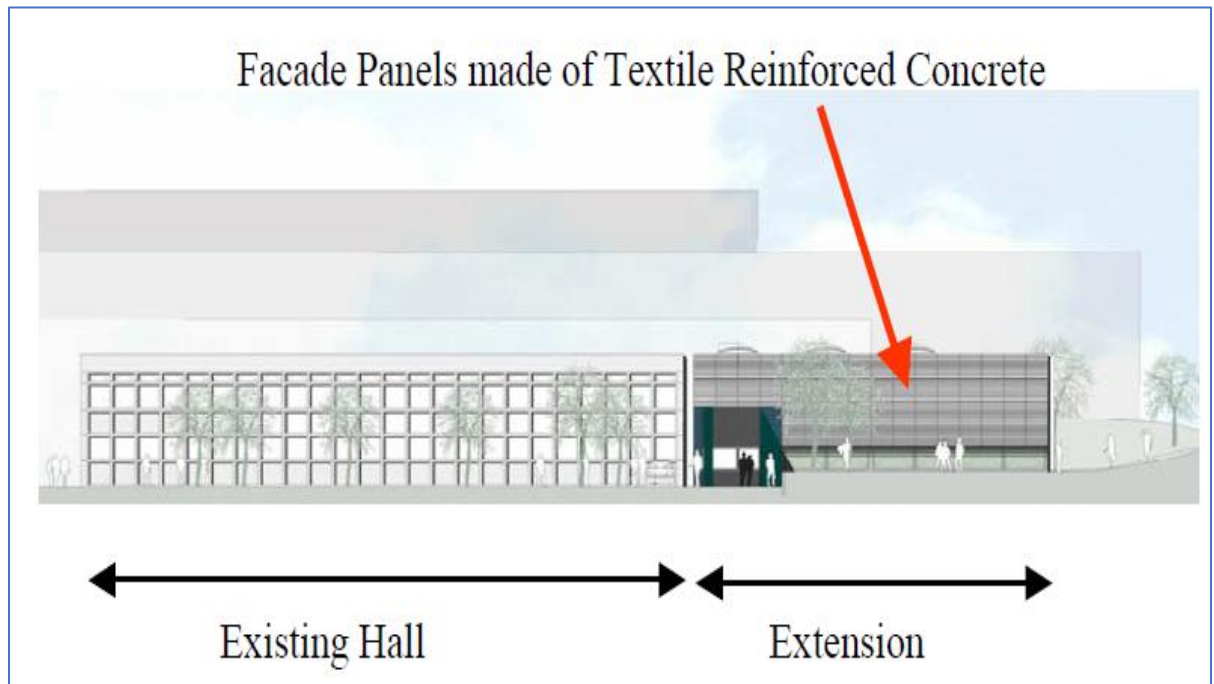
New extension of the testing hall of the Structural Concrete Institute Aachen University (Curbach et al., 2006)
